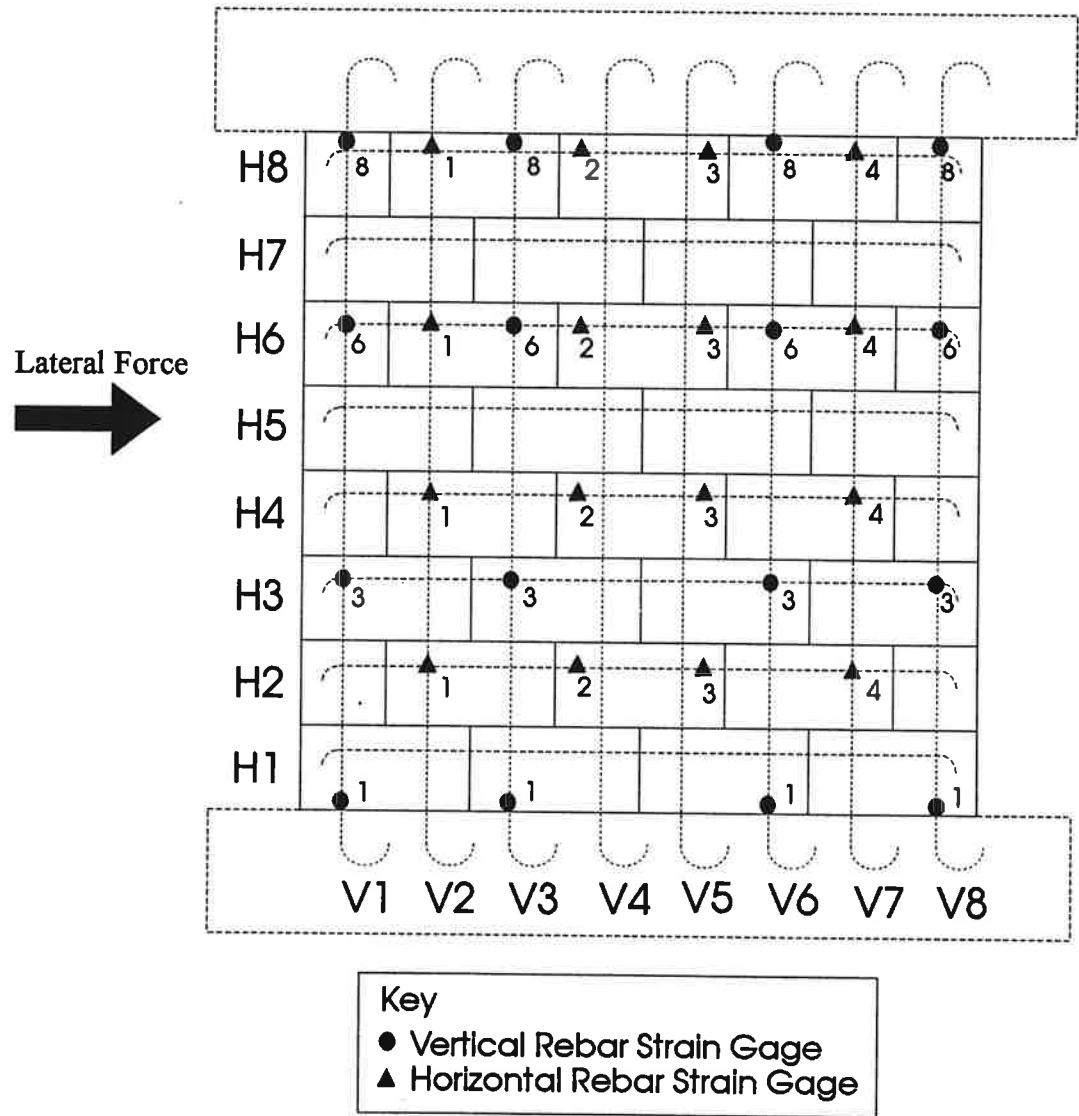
Monolithic Wall Reinforcing Bars Strain Gage Positions
